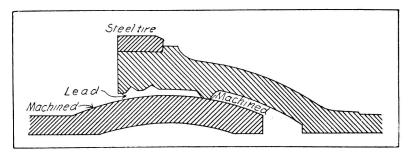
Flexible Joint on Pipe Across the Hackensack River
